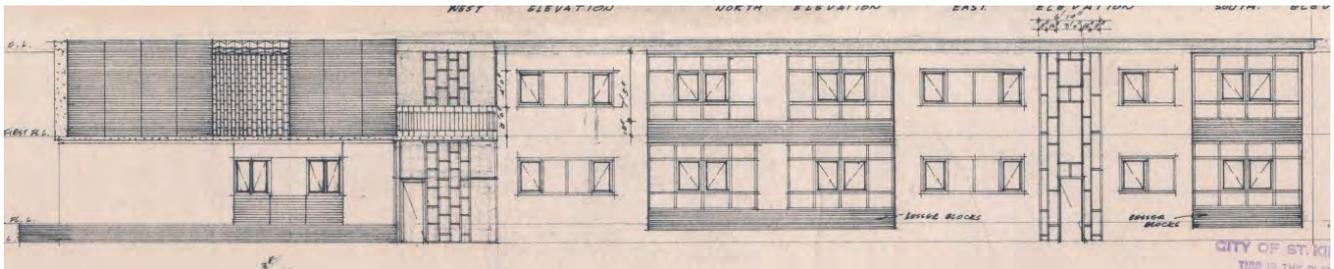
& 4 - East and north elevations, from drawings related to permit no. 57/2966 (M Feldhagen, 1963) (Source: Council Building File)
